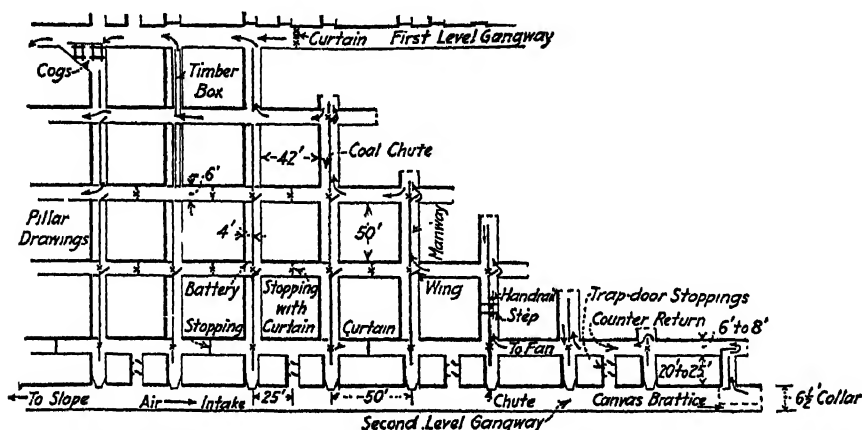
DEVELOPMENT BY CHUTE-AND-PILLAR SYSTEM AND DETAILS OF VENTILATION PRACTICED IN PIERCE COUNTY DISTRICT.
